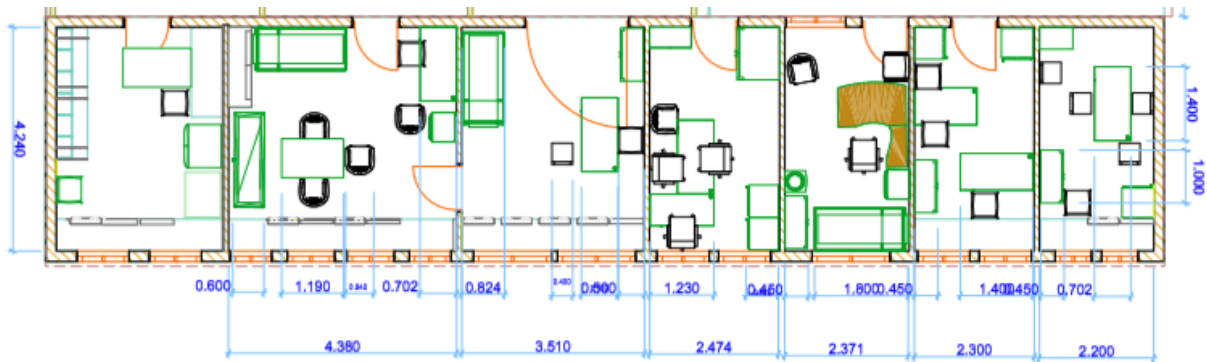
current site interior architecture layout (source, author 2020)
